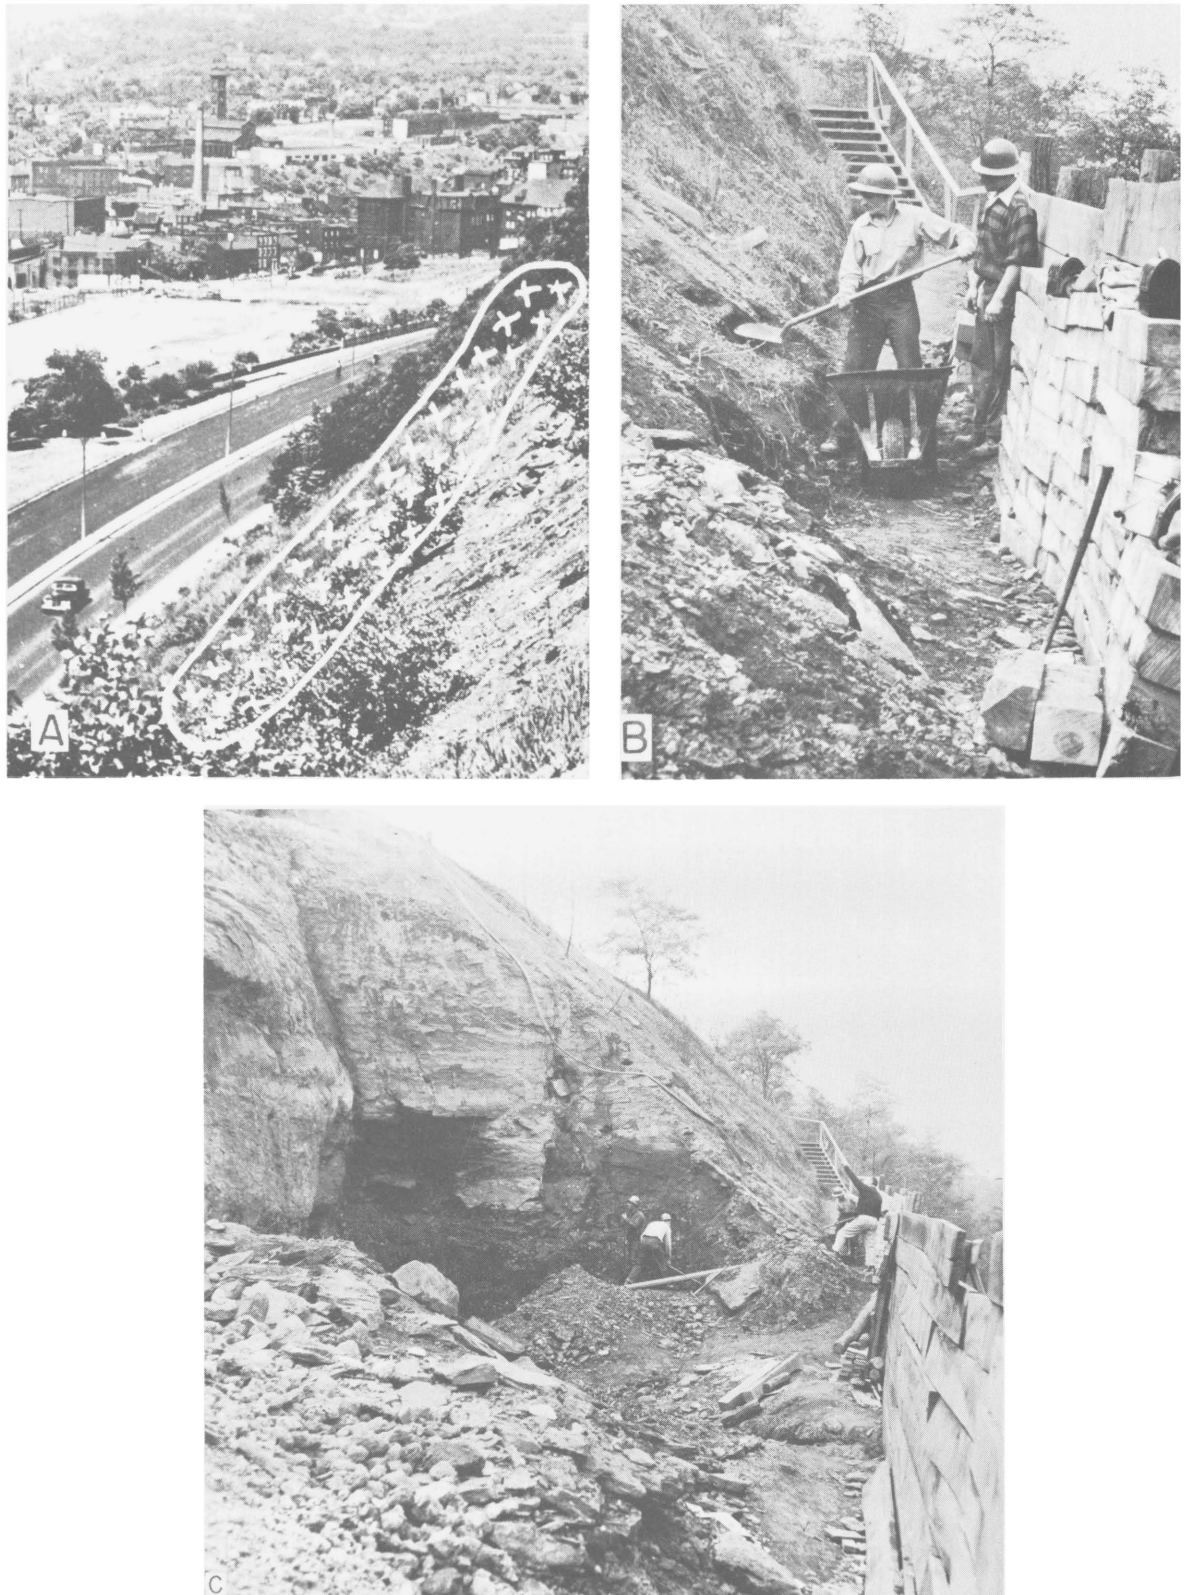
A, Site of Underground Mine Fire; B, Preliminary Work Before Loading-Out Fire; C, Loading-Out Underground Fire.
